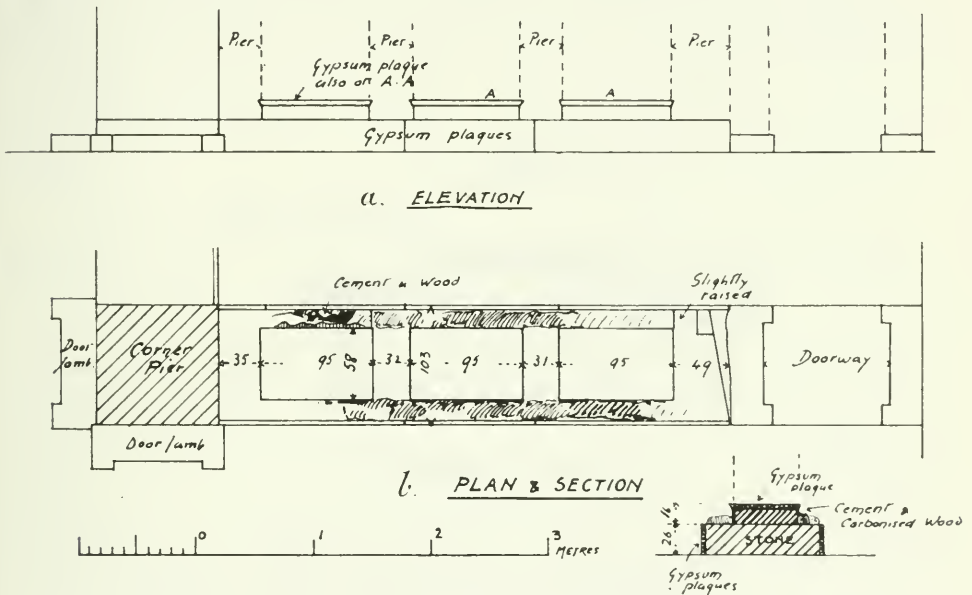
PLAN, SECTION, AND ELEVATION OF RAISED STYLOBATE WITH DOUBLE BENCH.
